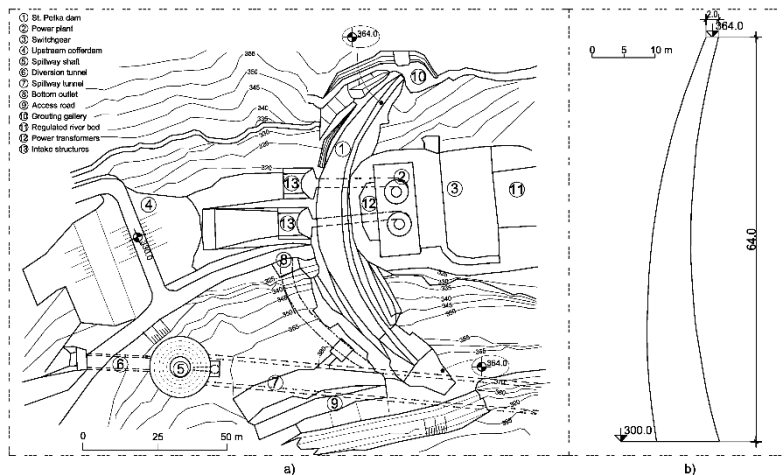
St. Petka dam. a) layout and b) typical cross-section
